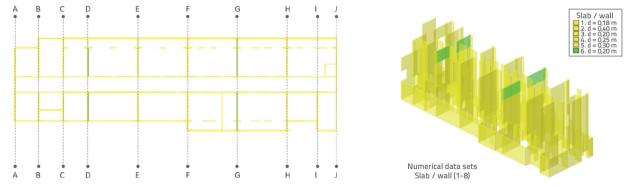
Plan view of the third floor and 3D model of the structure, with marks showing walls to be made of recycled-aggregate concrete.
